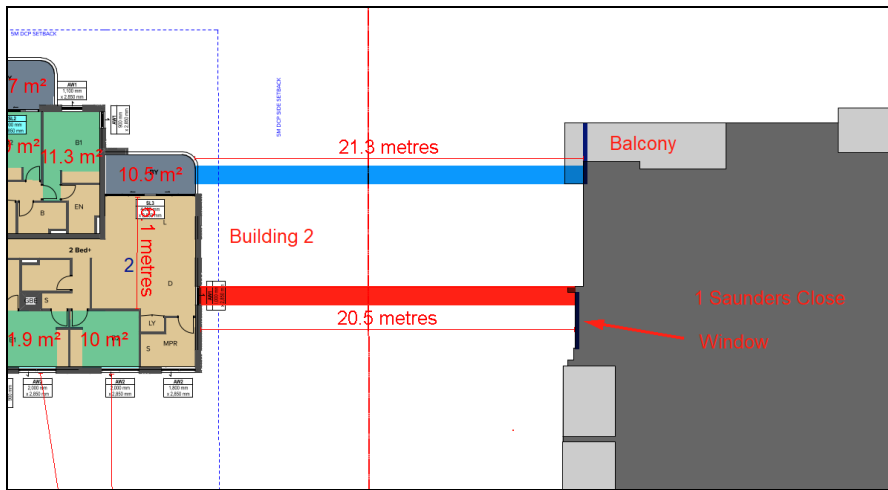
Visual privacy from Building 2 to 1 Saunders Close.
